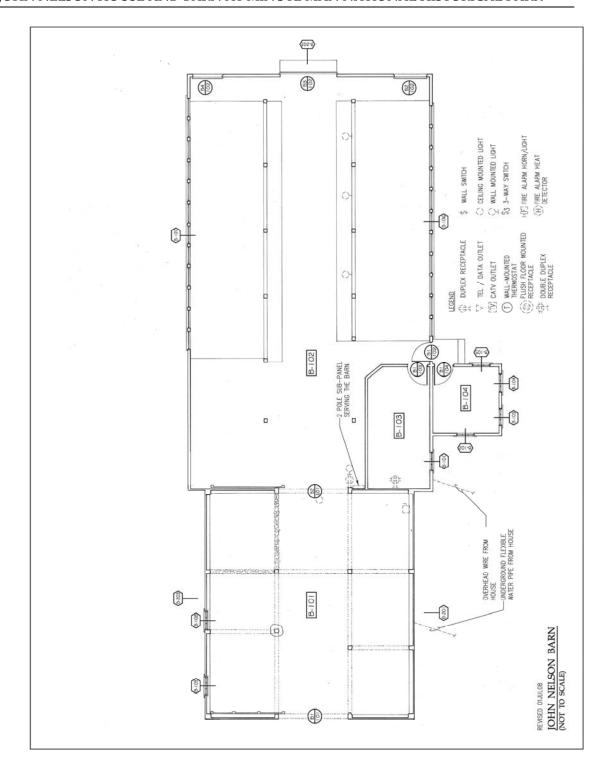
Mechanical, Electrical, and Plumbing key plan, Barn.
